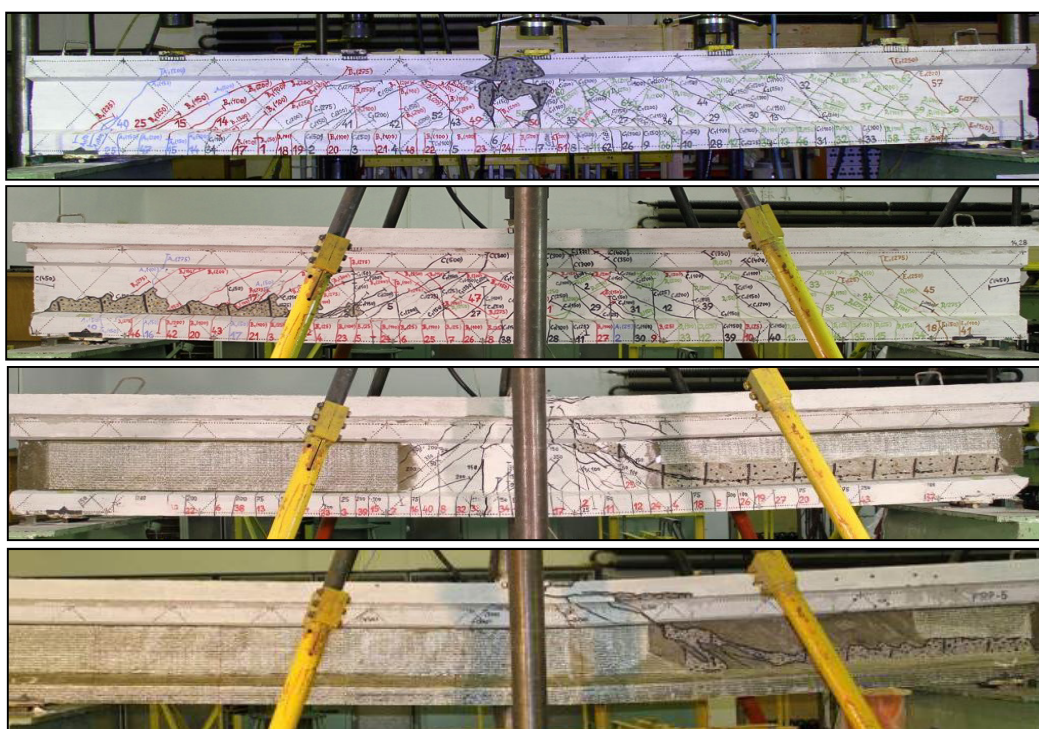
Way of failure – a) non-strengthened beam, b) strengthened beams ST, GFRP1, GFRP2.
